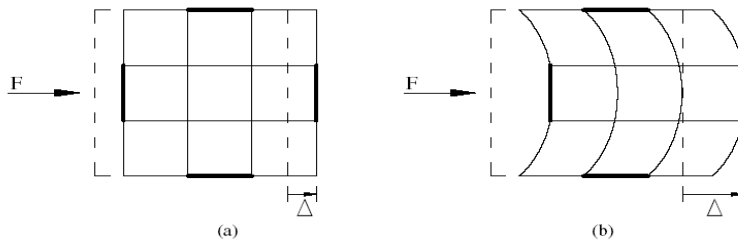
Structure deformations with rigid slab (a) and with flexible slab (b)
